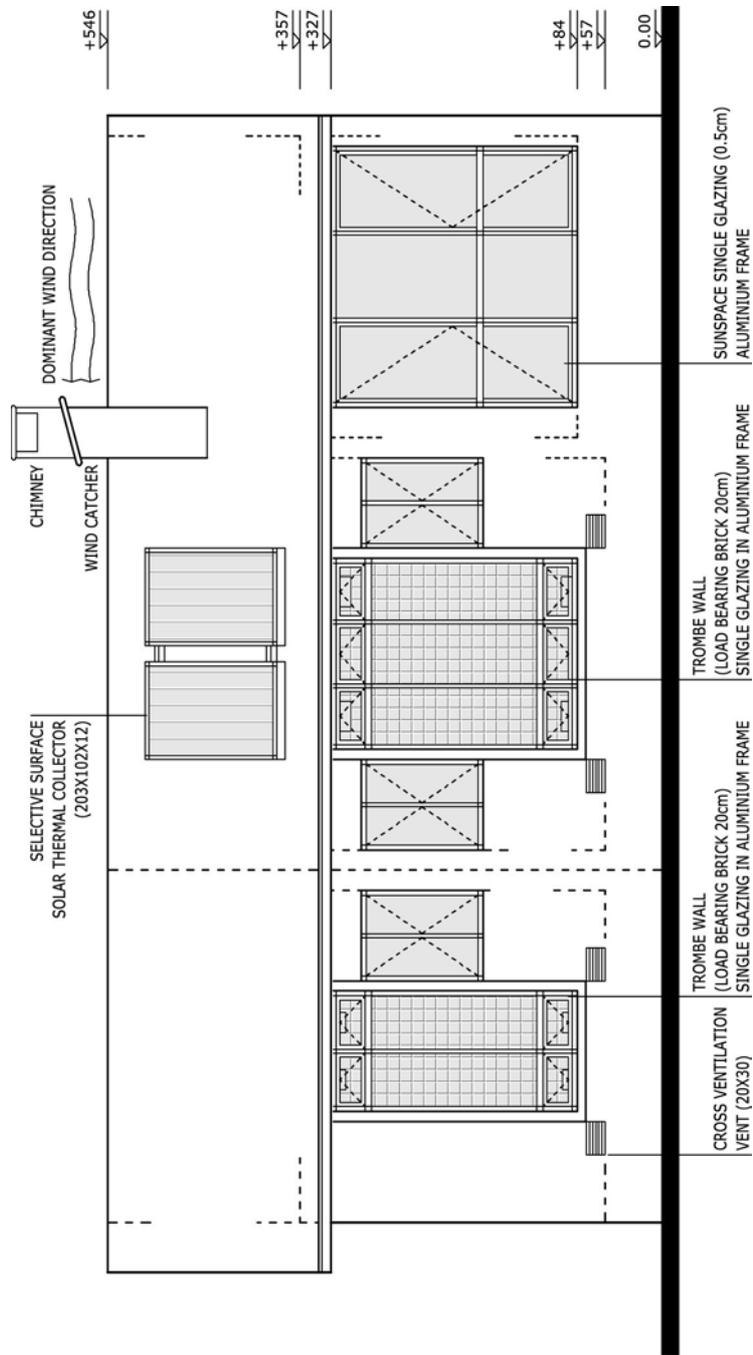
Southern façade of type D₁' dwelling; Scale 1/80
